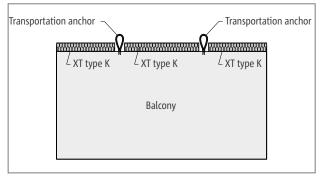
Schöck Isokorb® XT type K: Precast balcony with transport anchor; insulating adapter XT type Z can be inserted on-site
